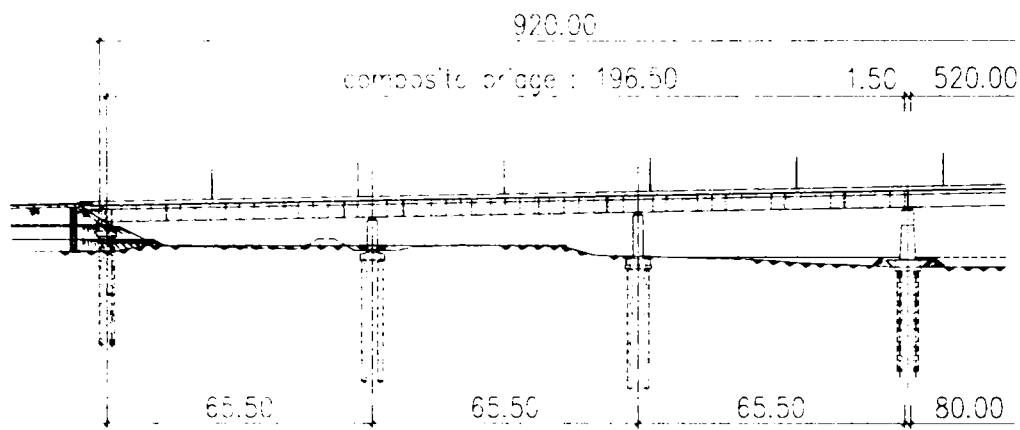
The elevation drawing of the floodplain bridge at Szekszárd over the Danube
